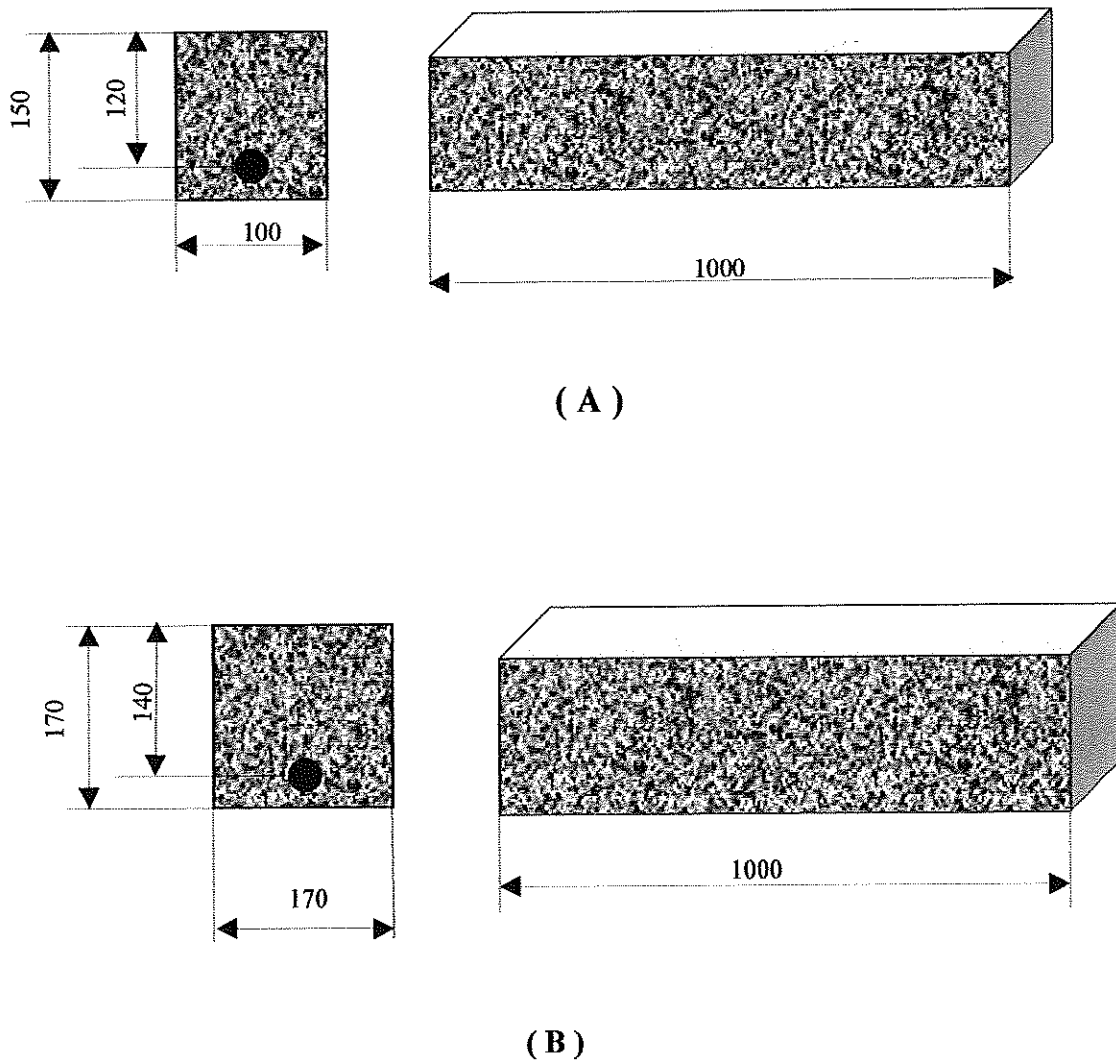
Reinforced concrete beams configurations for: (A) trial 1 and (B) trial 2.
